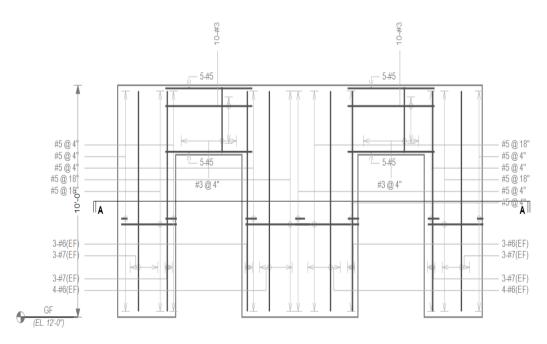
Reinforcement arrangement of Spandrel (At GF Floor Level)
